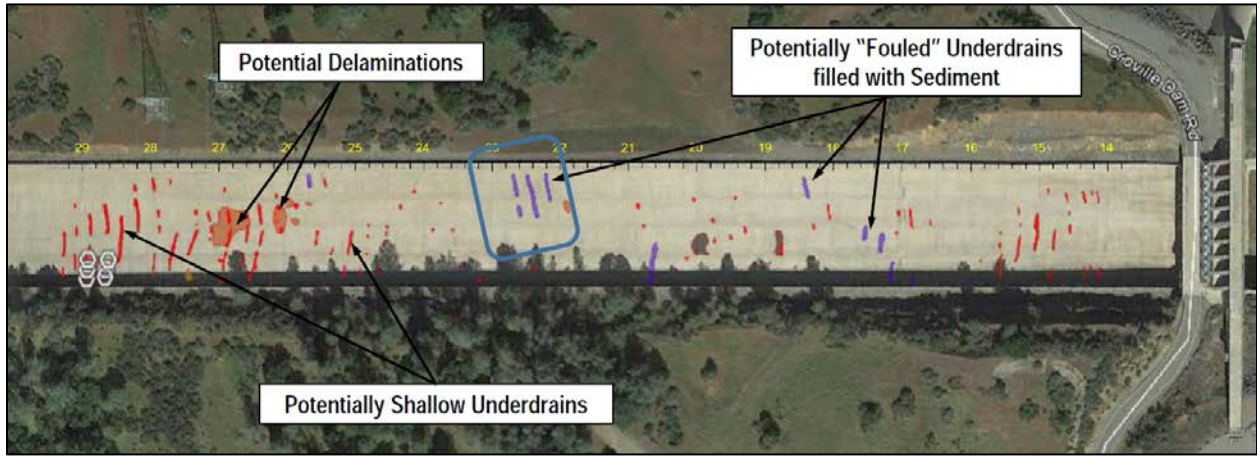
Location of Potentially Blocked Underdrains and Potentially Shallow Underdrains
